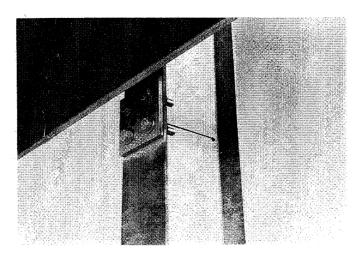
Tension Fuse Plate Installed on Sign Support (4)
